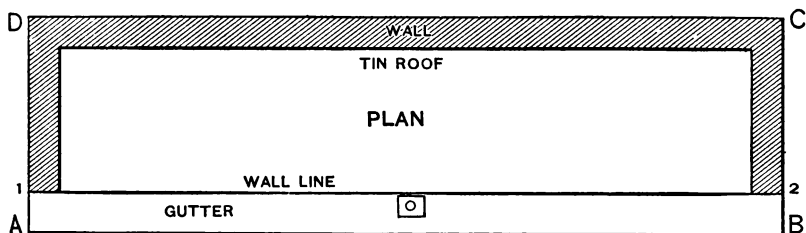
Roof Plan, Showing Leader and Gutter.
